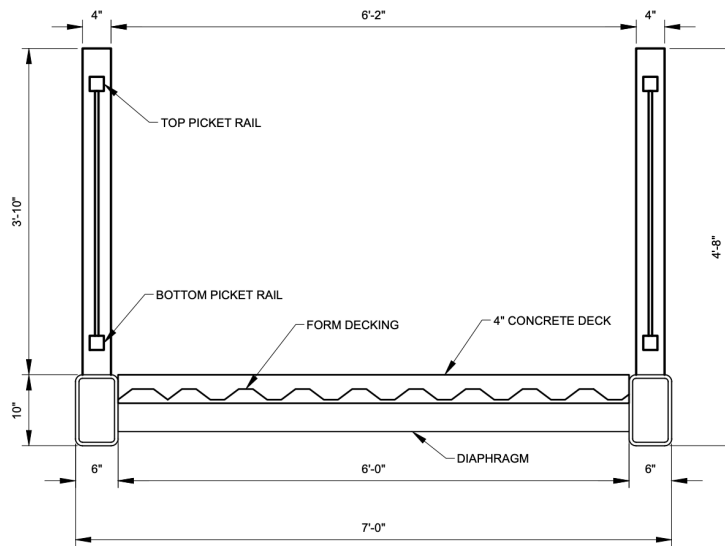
Proposed dimensions and details of the north and south ends of the bridge.
